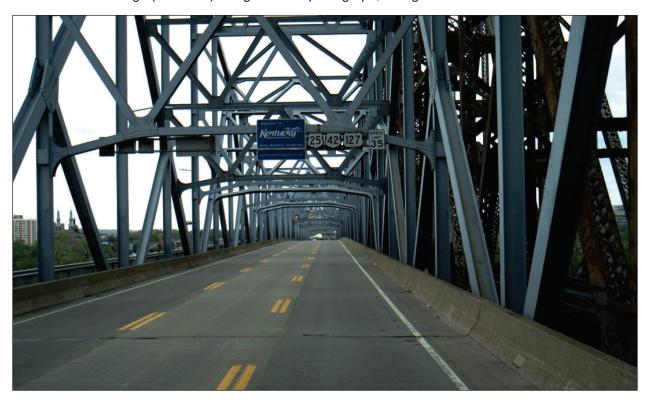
Looking toward Kentucky state line on Clay Wade Bailey Bridge (KEC-1075), with Chesapeake & Ohio Railroad Bridge (KEC-107) on right side of photograph, facing south.
